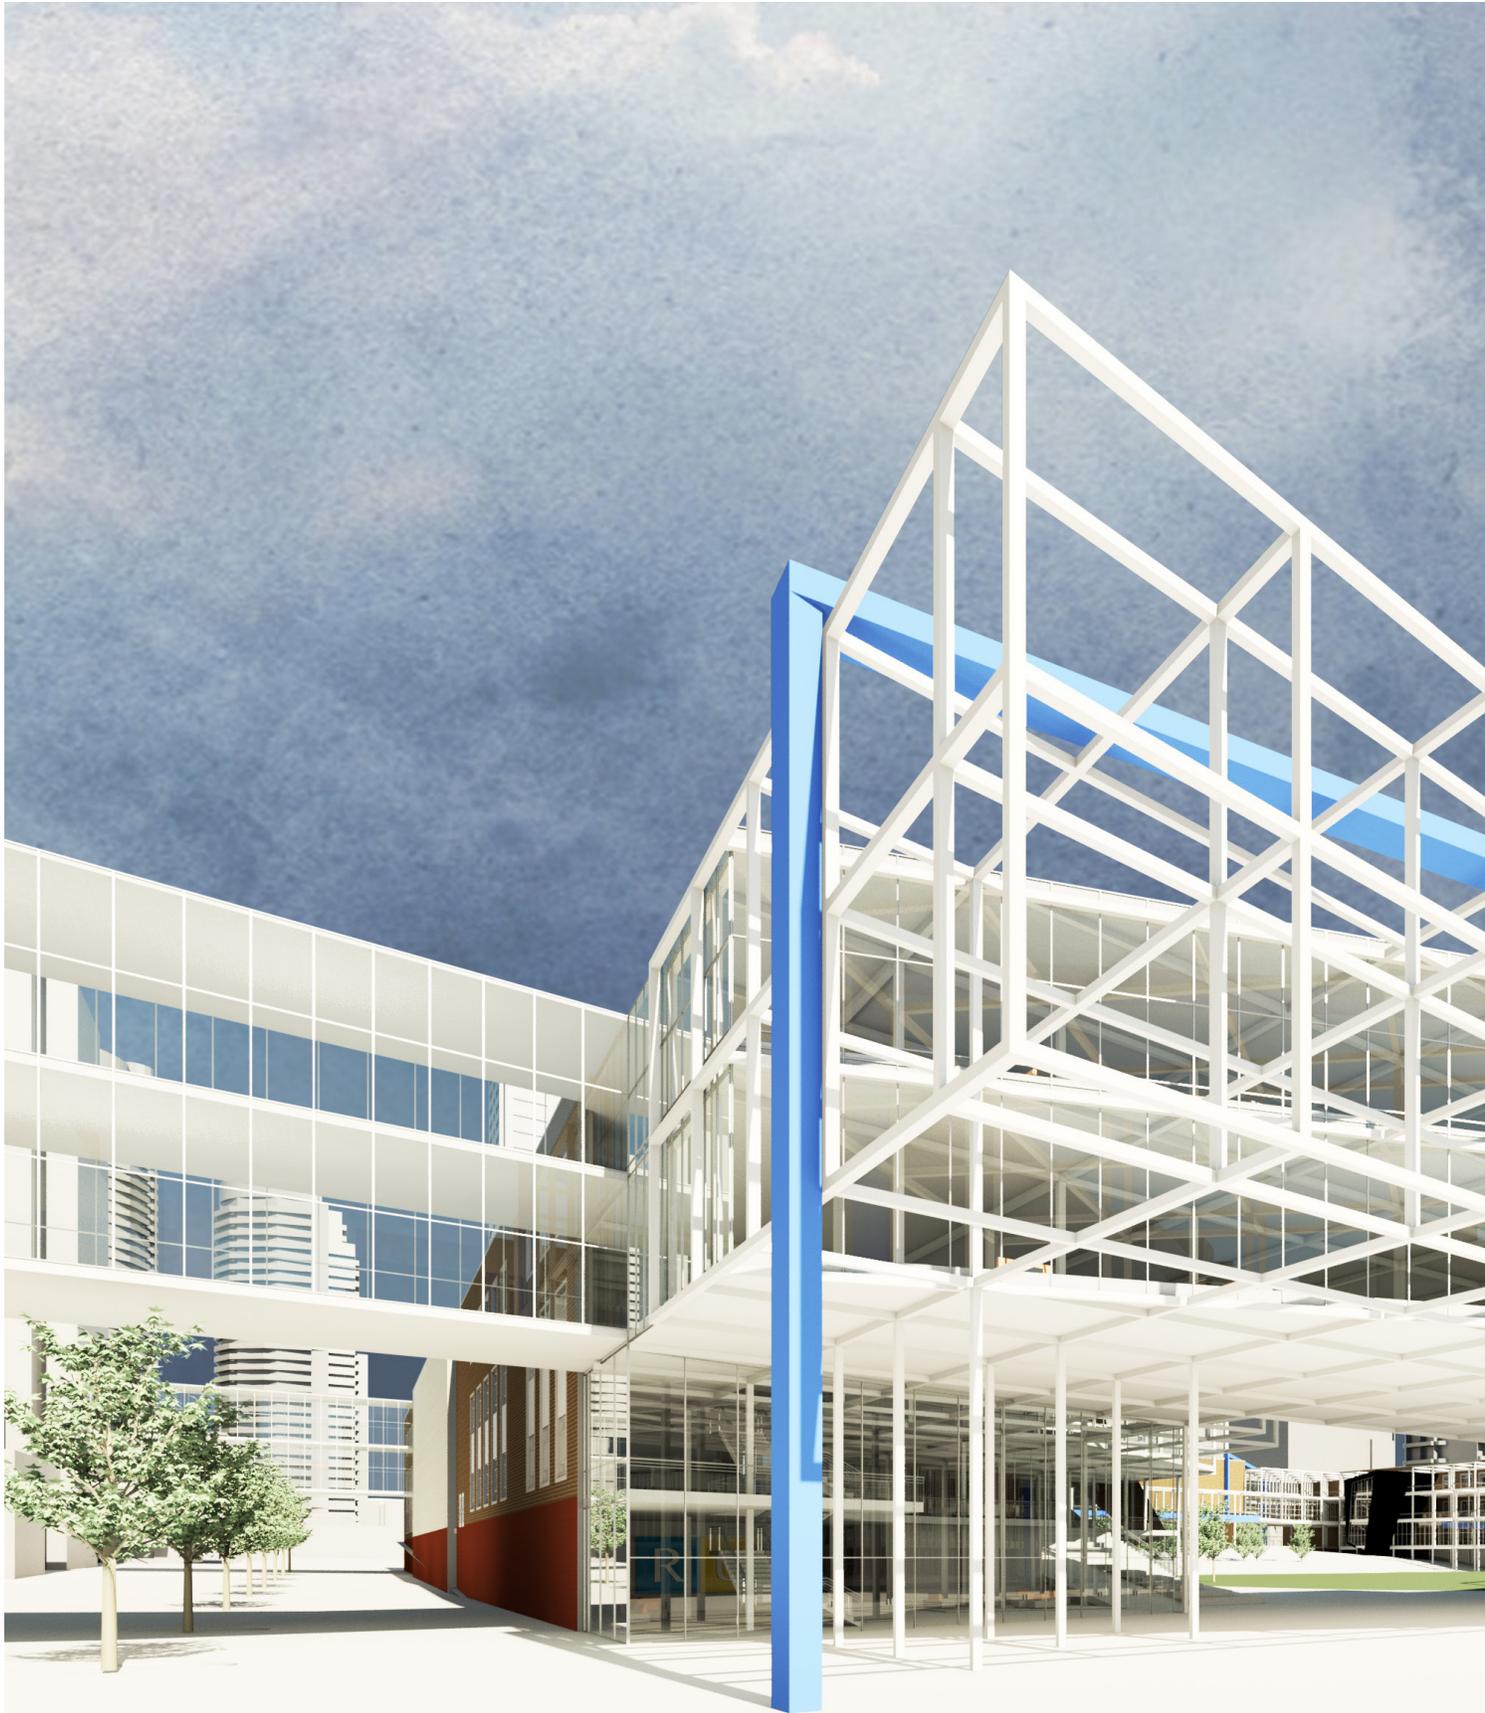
View from the corner of Gould and Victoria Street, looking northeast towards quad entrance portal
